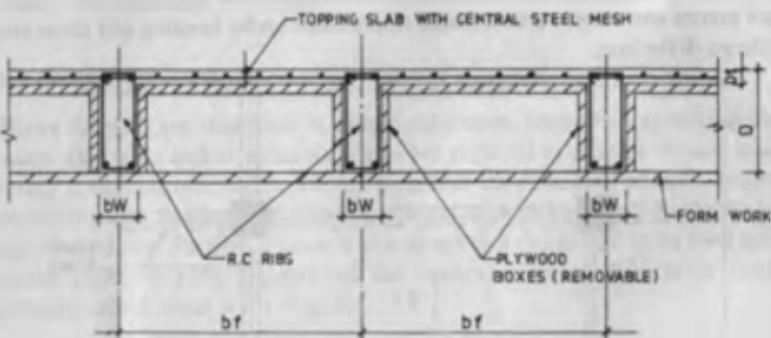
Ribbed slab cast on forms removable after the concrete has set (this looks ribbed from below).
